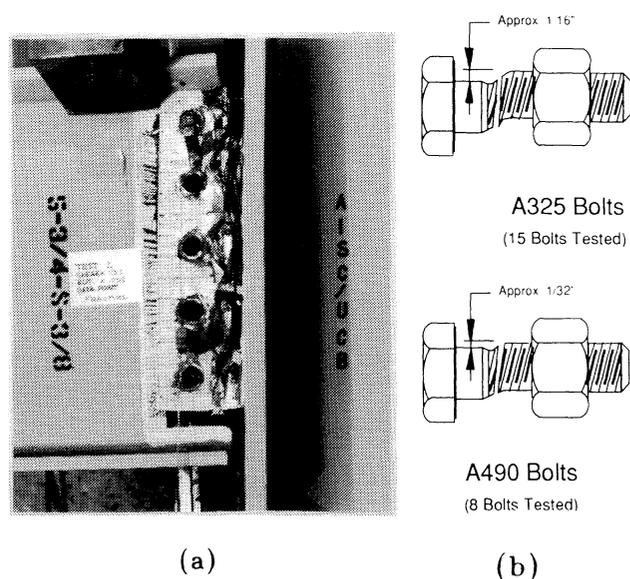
Typical Bolt Failure of Test Specimens
